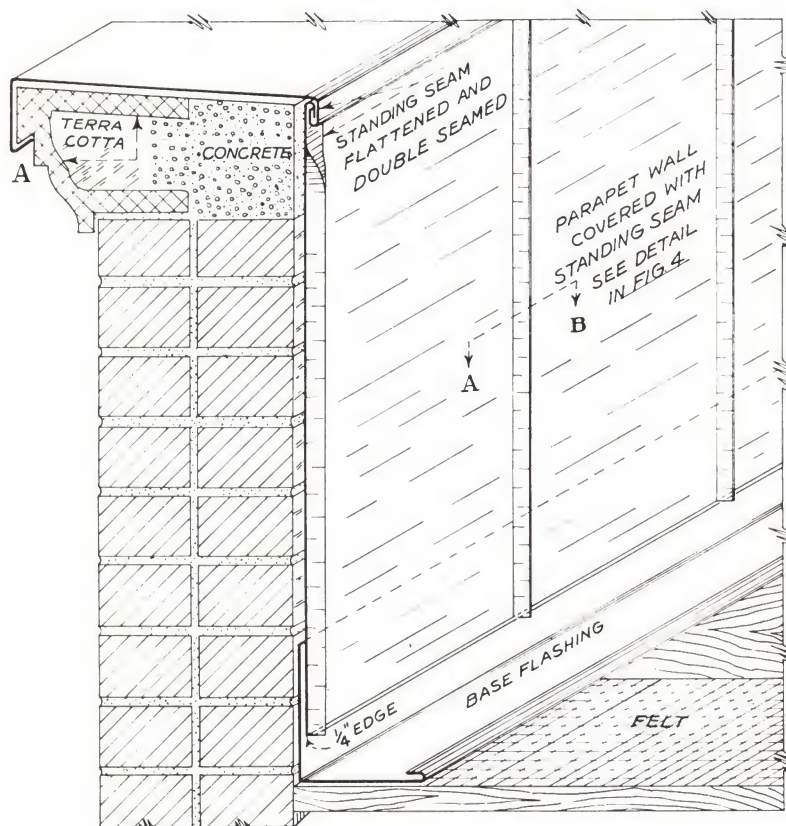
FLASHING BRICK PARAPET WALL AND TERRA COTTA COPING WHEN WALL IS OVER 16" ABOVE ROOF LINE SCALE - 1 1/2"=1'-0"
